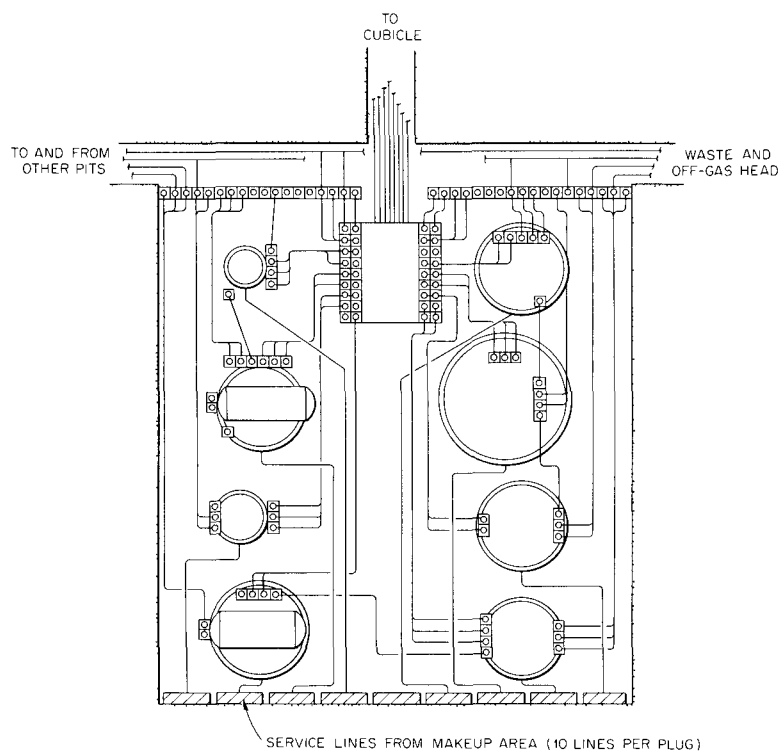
Typical Tank Pit Piping Layout, Plan.
